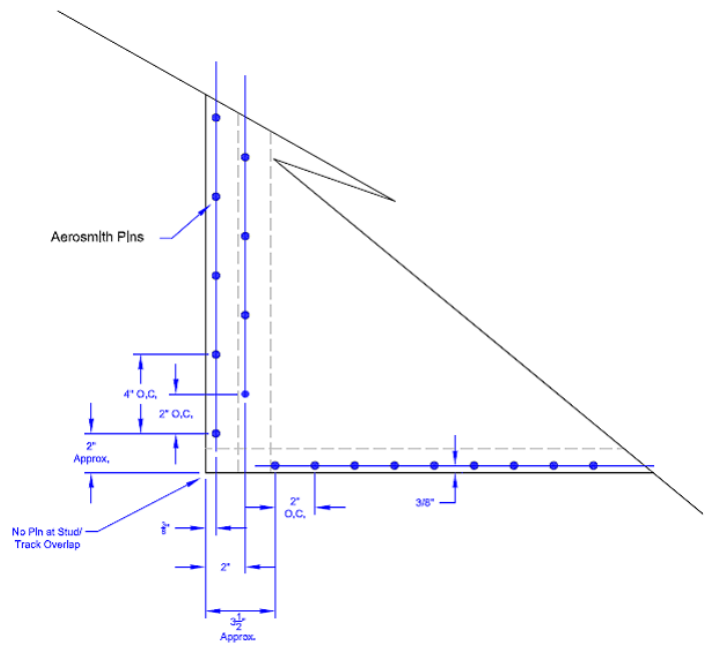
FASTENING PATTERNS FOR WOOD STRUCTURAL PANELS ATTACHED TO DOUBLED STUDS AT WALL ENDS
